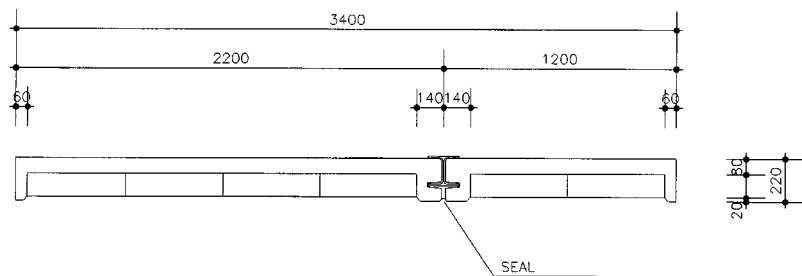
Barrier CON4: plan view of typical components. Dimensions in millimeters.
